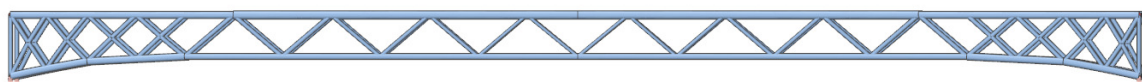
FIRST MAIN TRUSS GIRDER LAYOUT, SIDE VIEW
